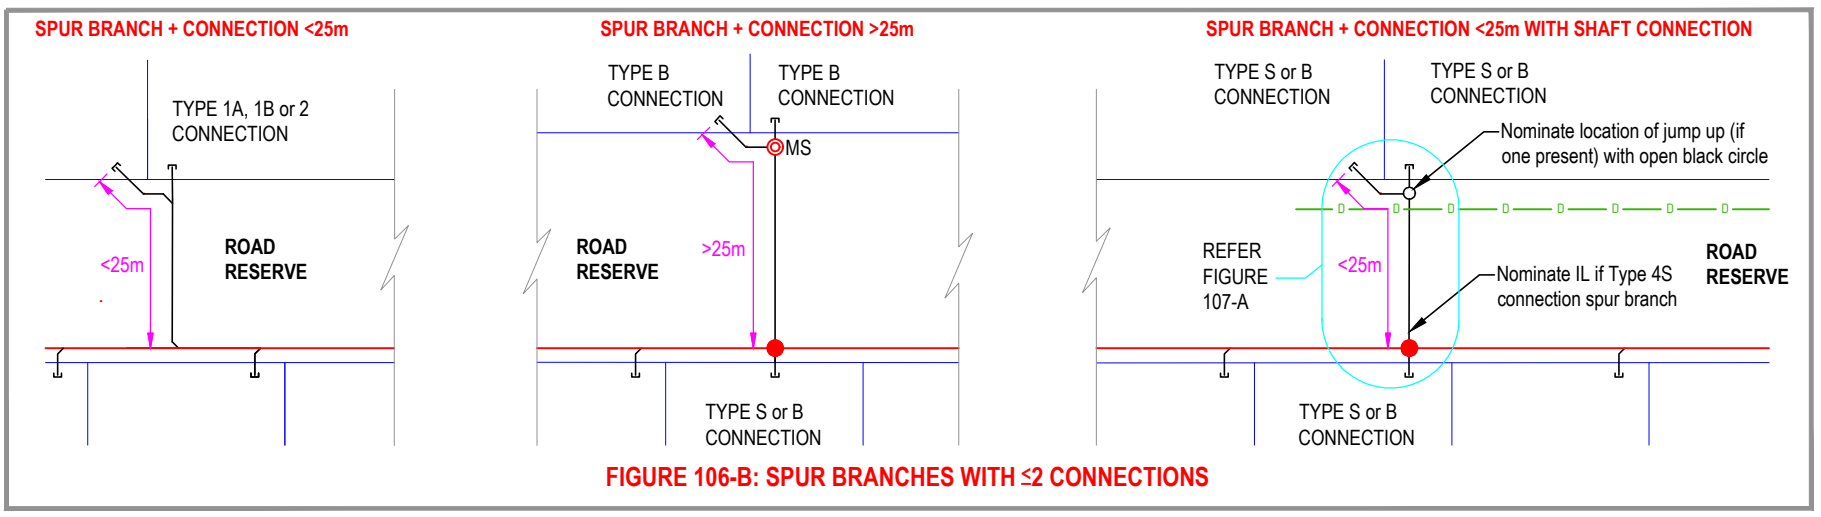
B: SPUR BRANCHES WITH ≤2 CONNECTIONS
